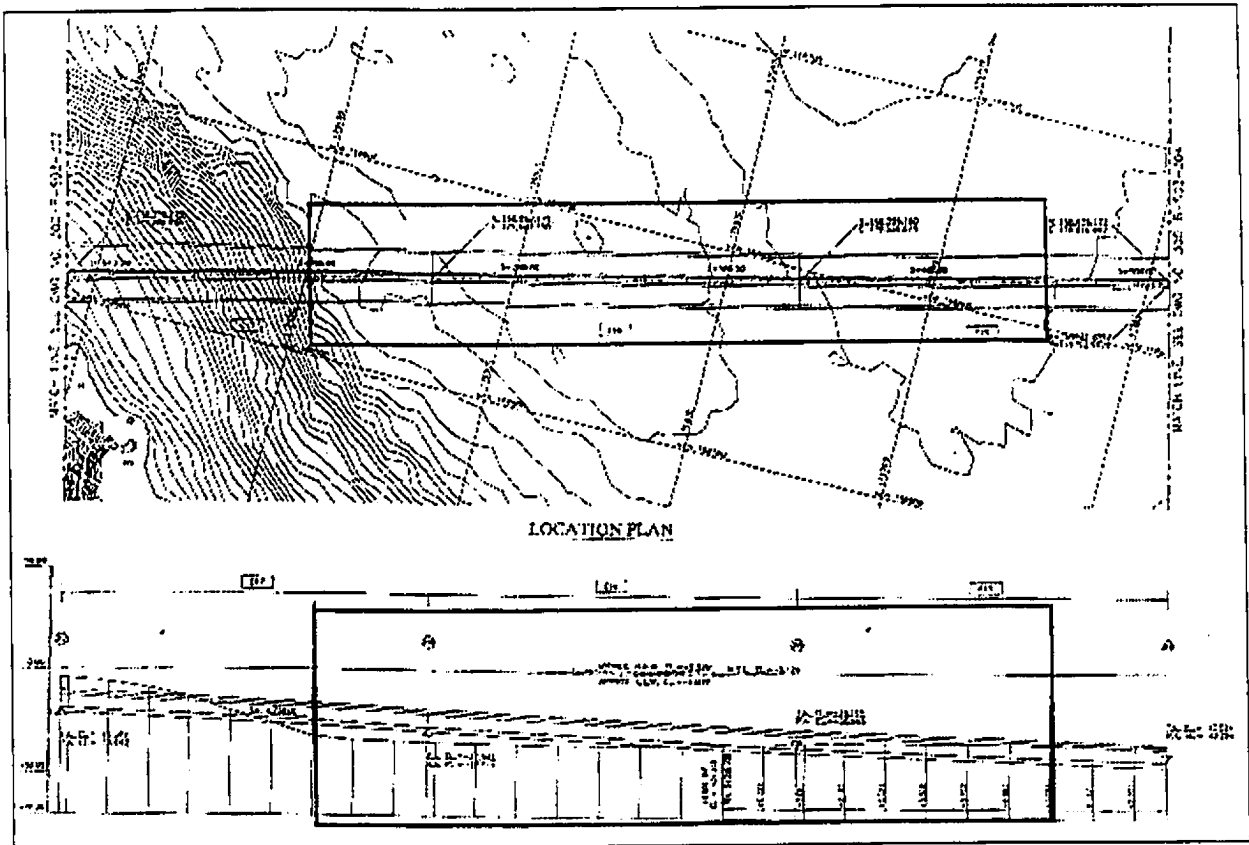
Location plan and profile drawing of the immersed tunnel (Hauge *et al.*, 2004)
